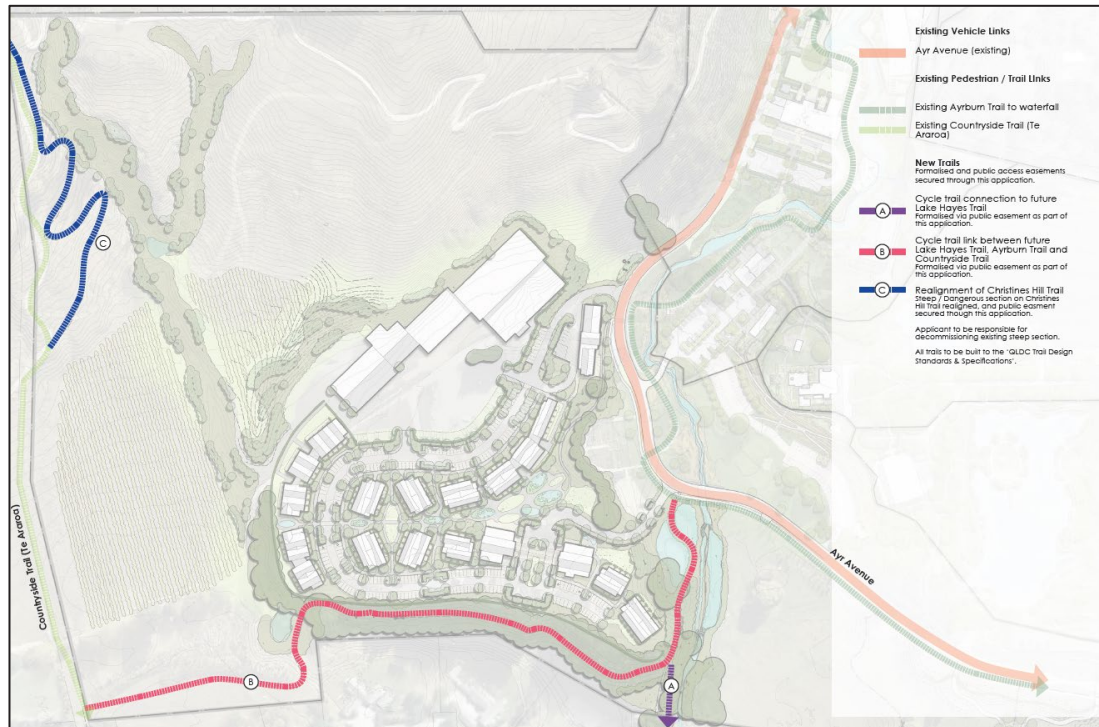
Cycle Trail Enhancements. Source: Design Report (Page 24) 'Public Trails Plan' (Appendix 7)
